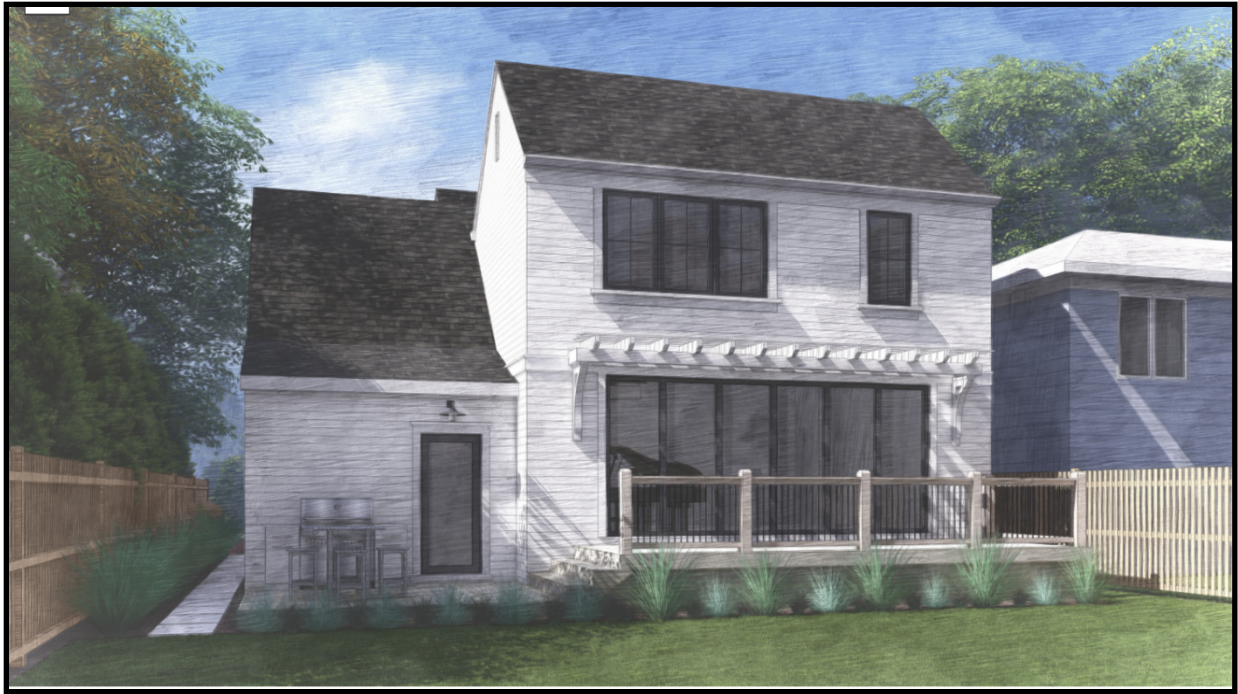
Rear Elevation Rendering – 15 Washington Avenue
